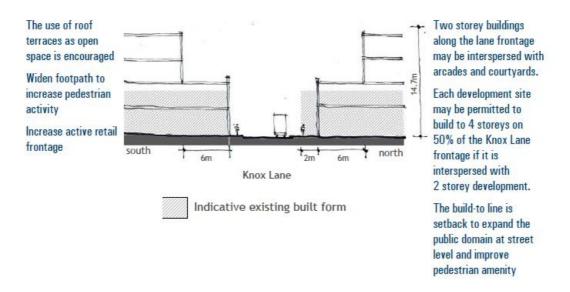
Cross Section through Knox Lane- Figure D5.4.9 in Woollahra Development Control Plan.
